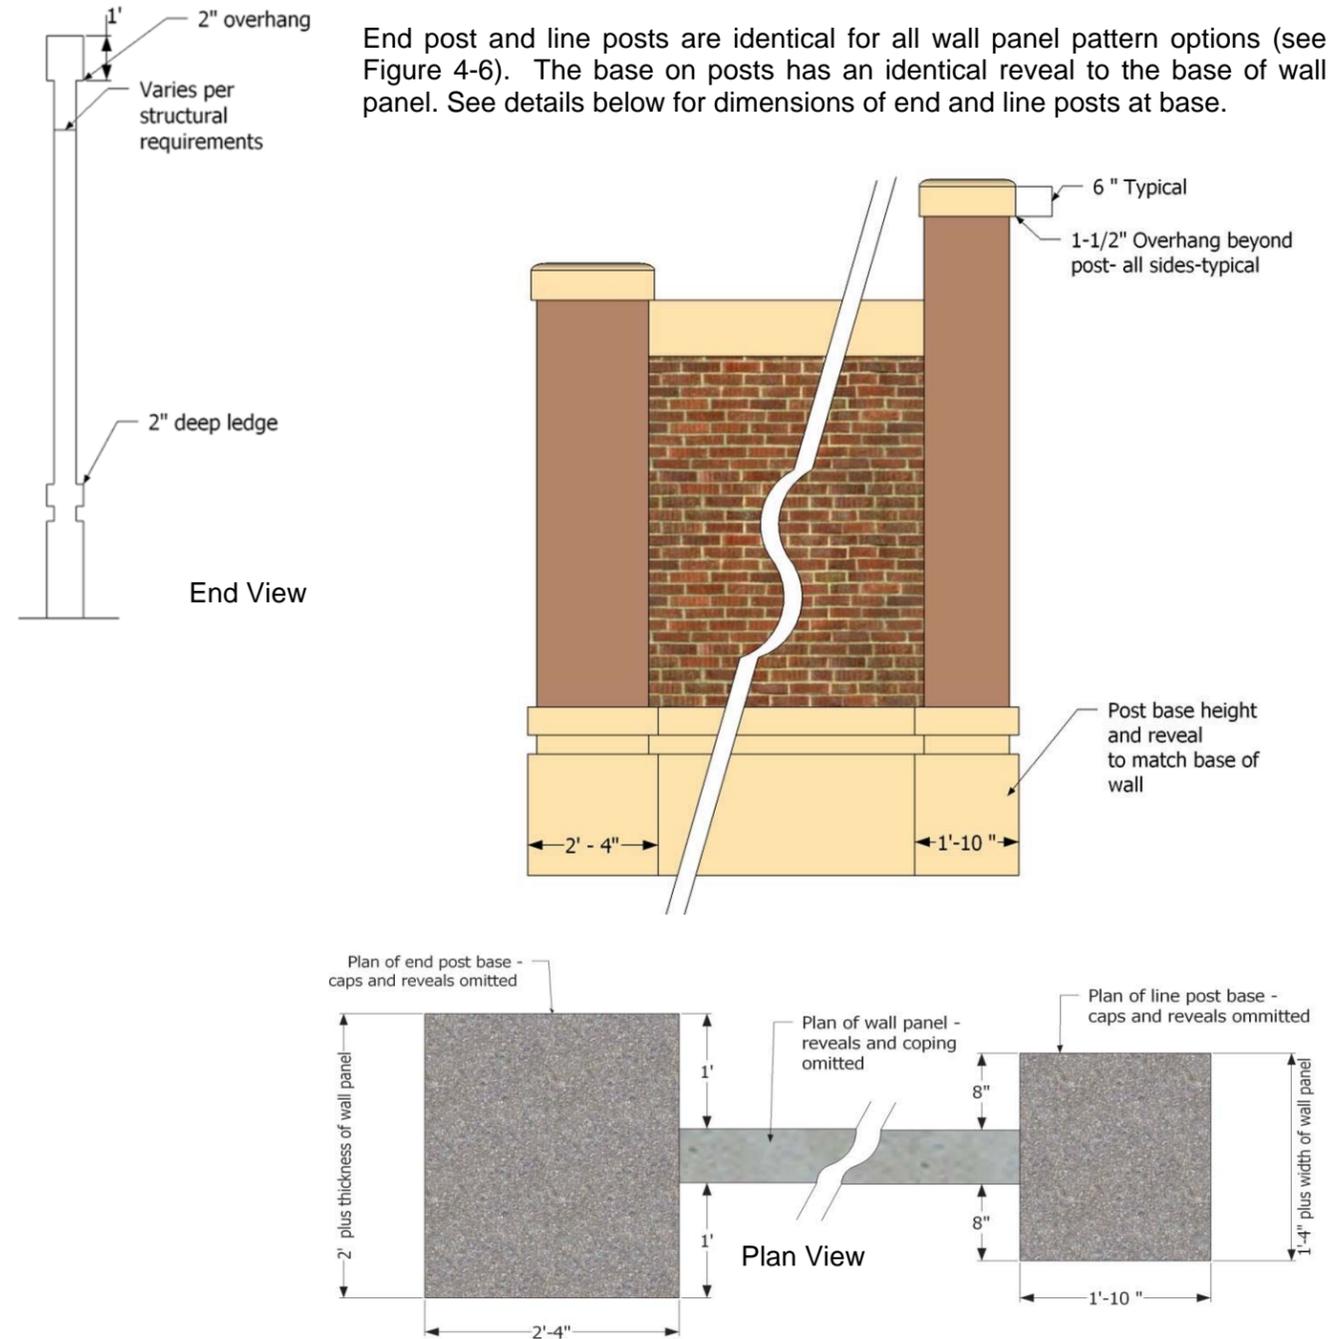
Elevation View and Plan Layout of Terminal/End and Line Posts
